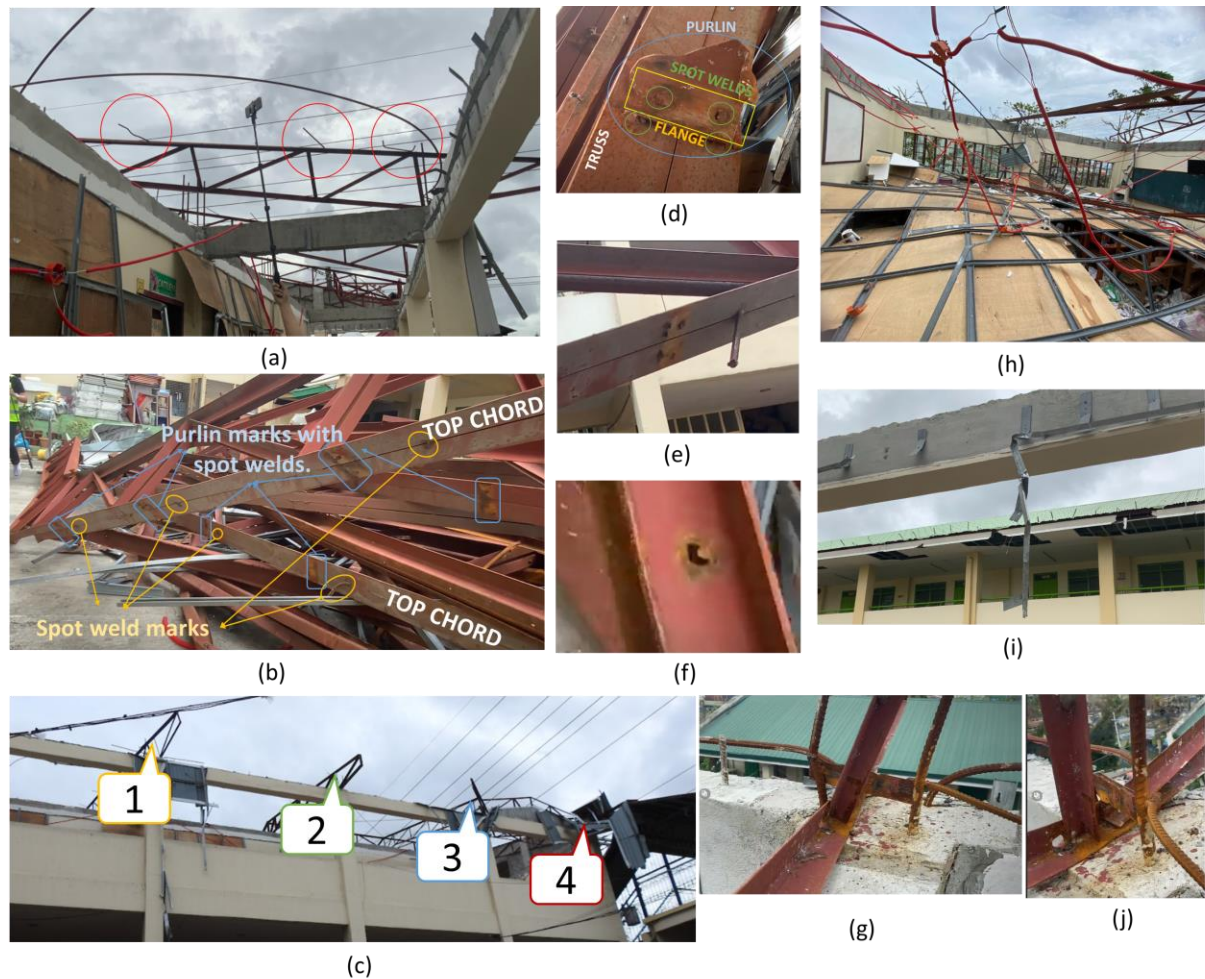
Observed failures in the school building due to Typhoon Odette. (a): Failure of the rebar used as purlin connections to the truss; (b): Observed connection marks on the blown-off roof trusses; (c): Remaining connected trusses; (d): Spot welds on the flange and edge of the purlin; (e): Protruding rebar used as purlin connection; (f): Burned markings around the hole on the purlin web; (g) shows a section view of the roof-to-column connection across the plane of the truss; (h): Observed ceiling collapse due to framing failure.; (i) ceiling frame connection failure; (j) shows a profile view of the RCC parallel to the truss .(by Tan, 2021)[15]
